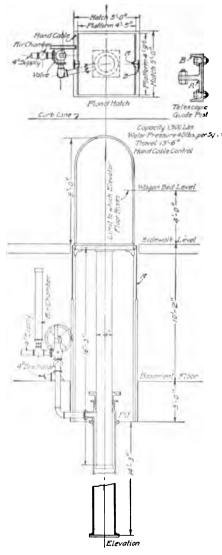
Details of Cylinder and Plunger of Hydraulic Elevator Courtesy of Standard Plunger Elevator Company, Worcester, Massachusetts
